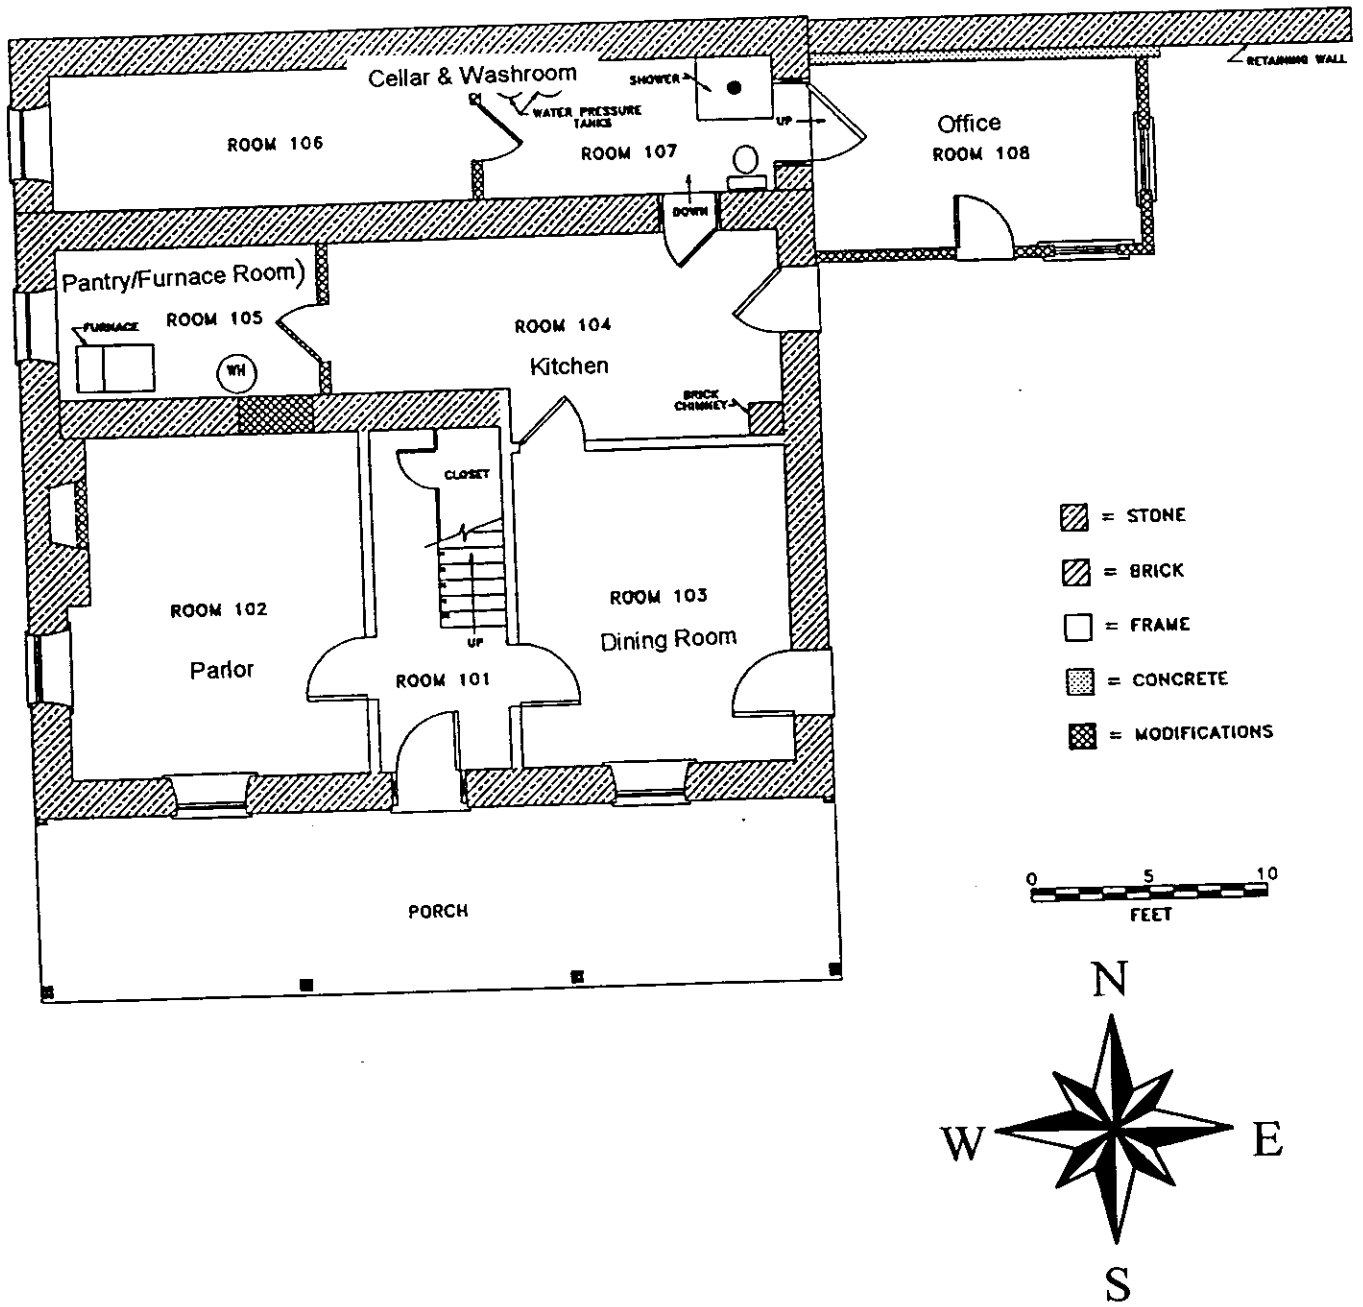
Ground floor plan of the Smith/Duncan House, existing conditions.
